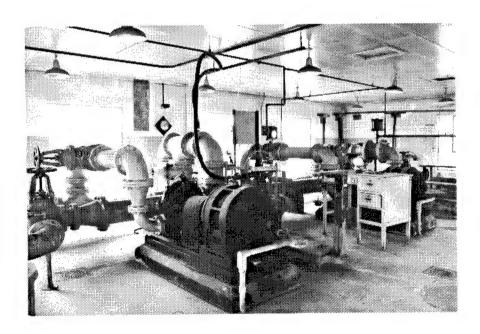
Building 6017: Gould's pumps and motor at this pump house.
